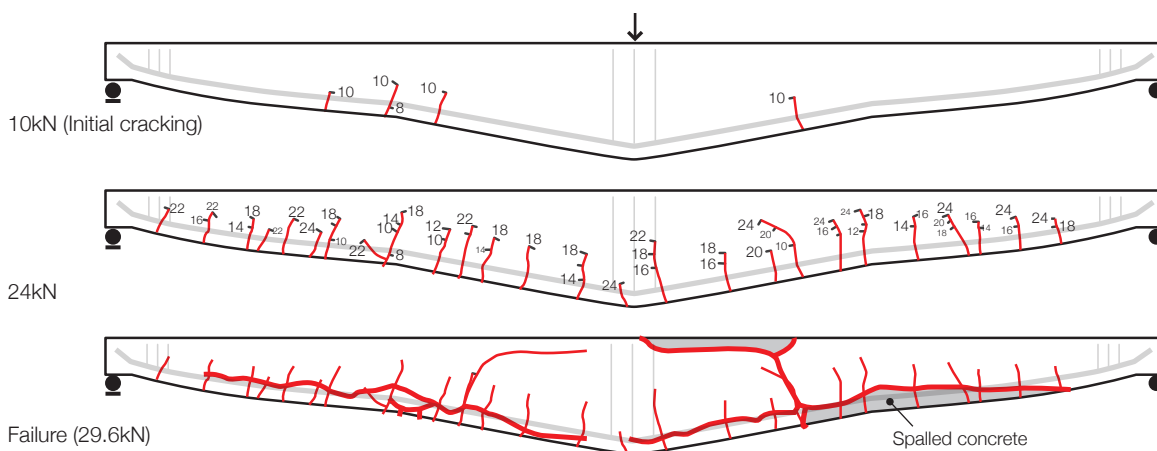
Cracking in Beam 9\_1\_CFP\_V.
